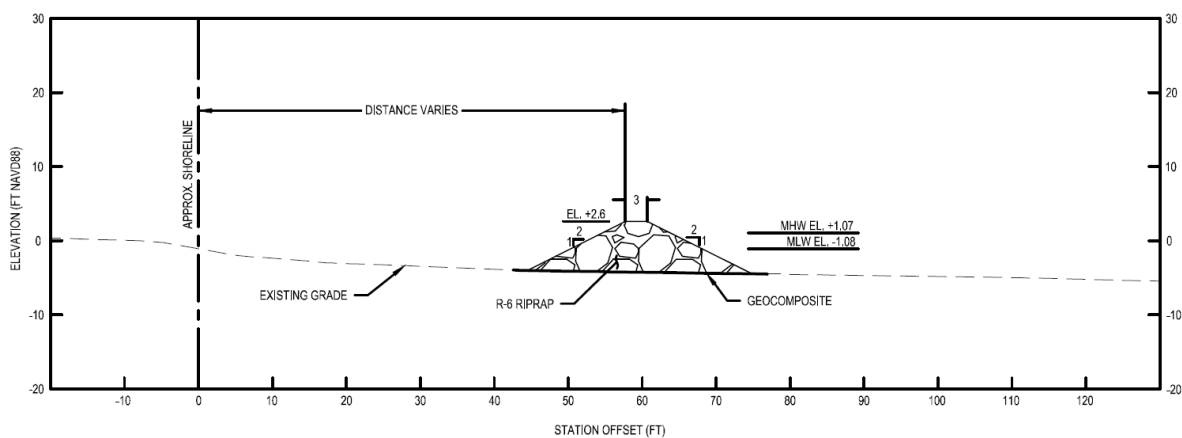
Typical Section of a Rubble Mound Breakwater at Alignment B
